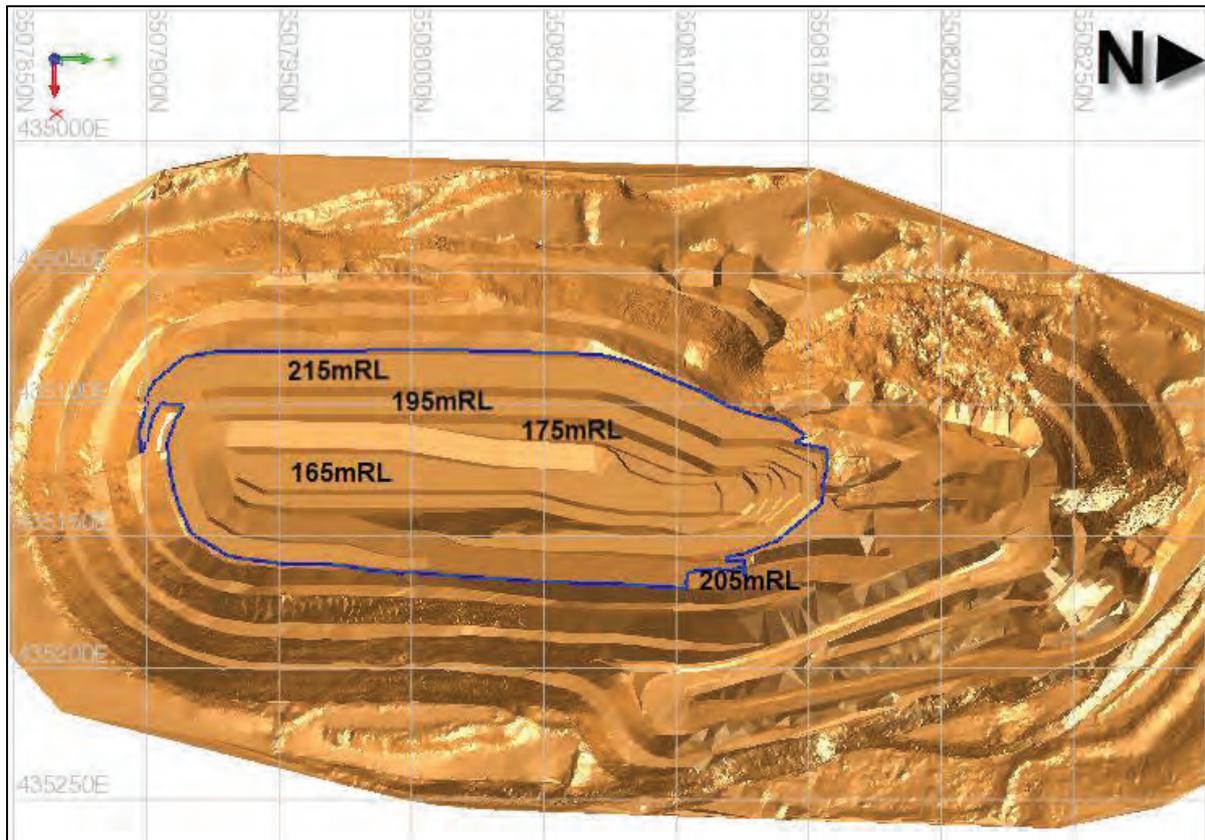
Plan view of open cut excavation design within blue “crest” line.
